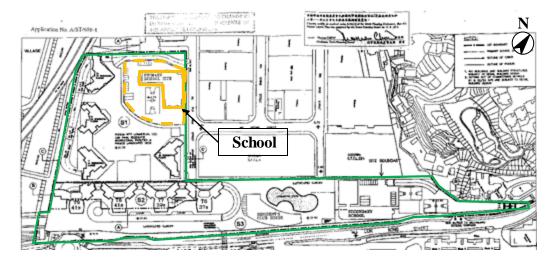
Master Layout Plan of the Comprehensive Development Area (CDA)
